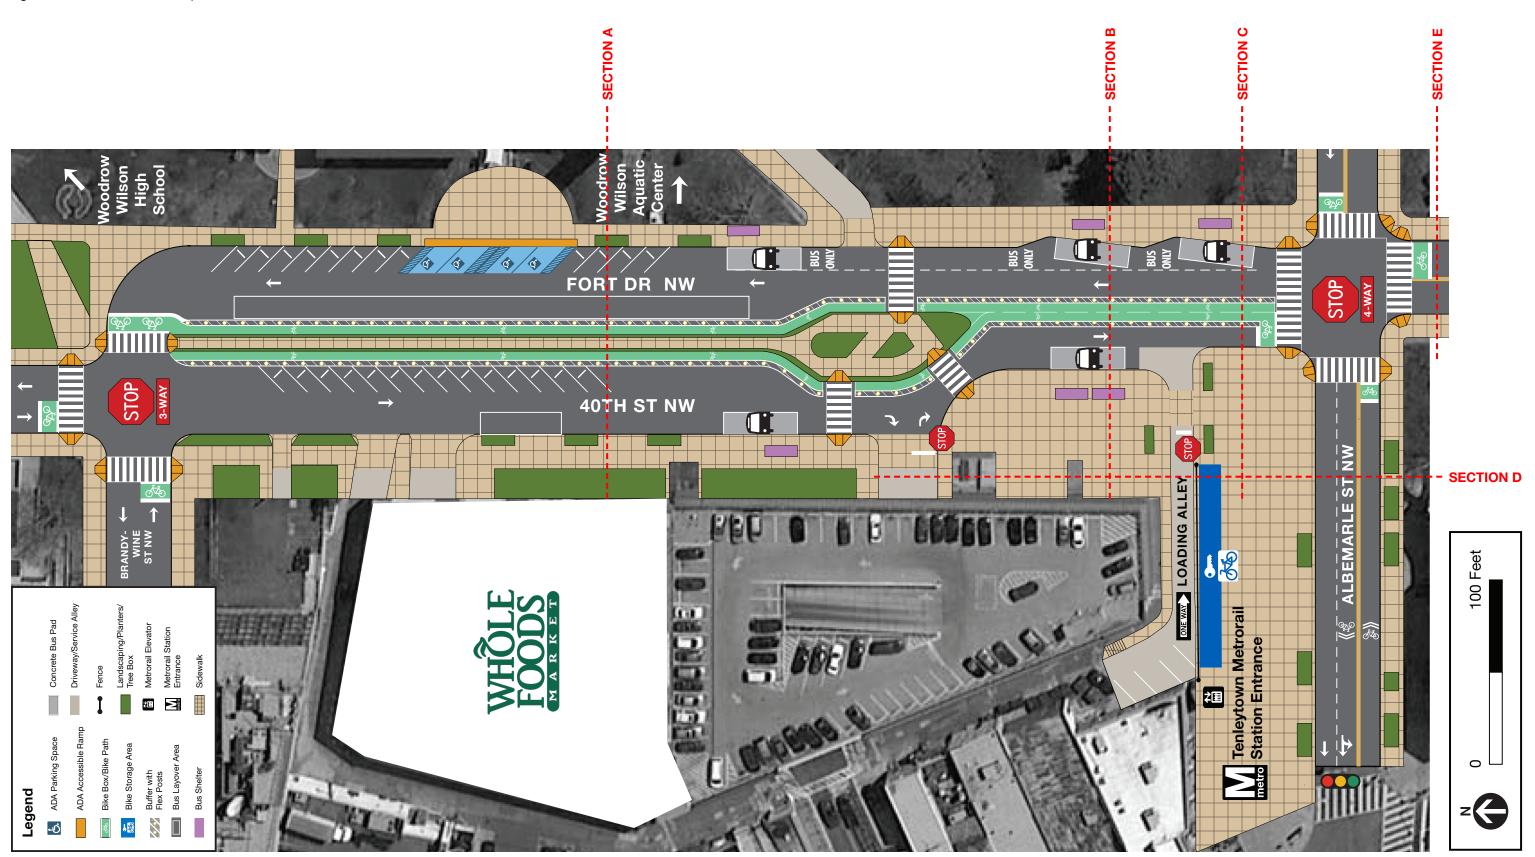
shows the site plan of Alternative 3. Figure 3-6 shows some of the sections through Alternative 3.
